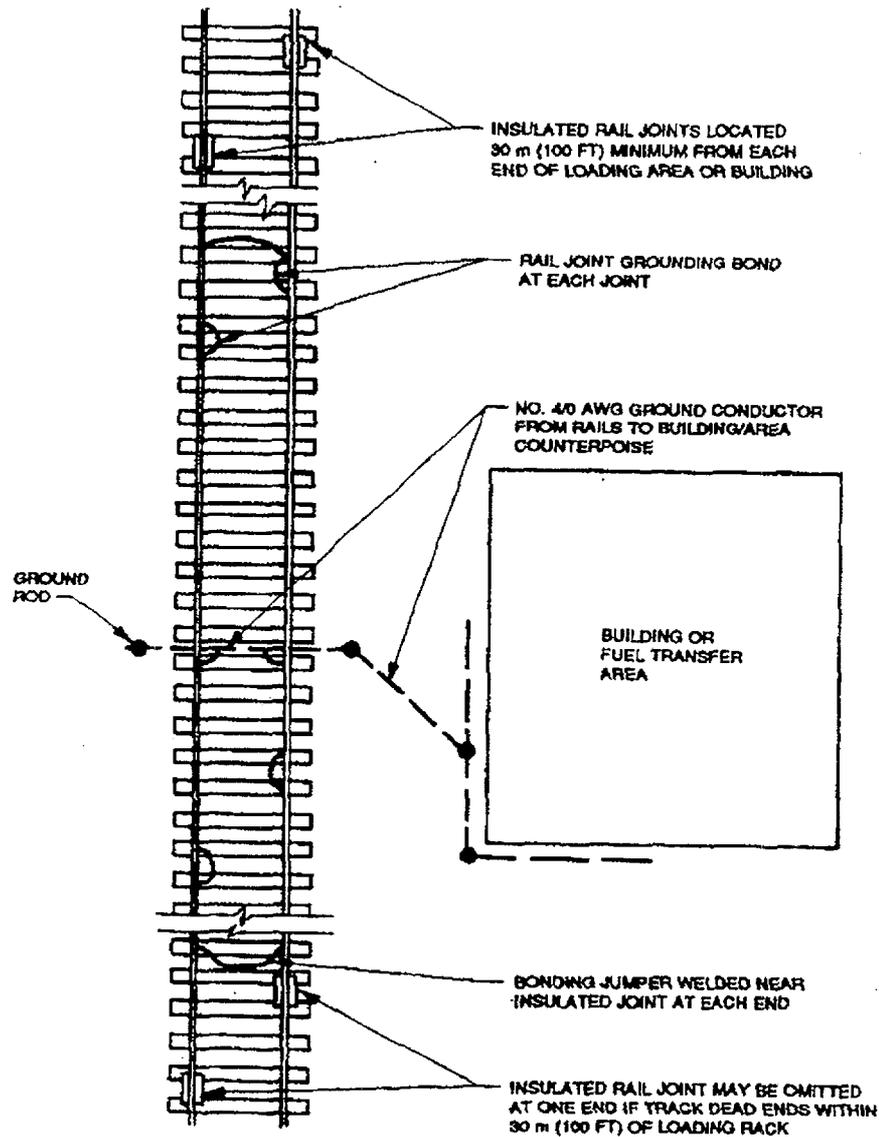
Lightning Protection Requirements for Railroad Tracks in Fuel Areas or Adjacent to Buildings
